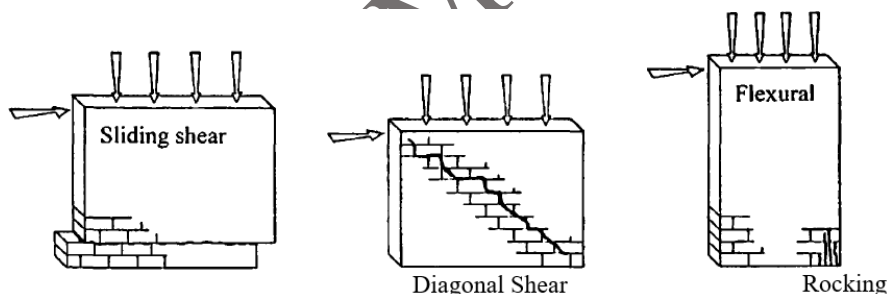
Typical failure modes of unreinforced masonry piers subjected to in-plane loading [57]
